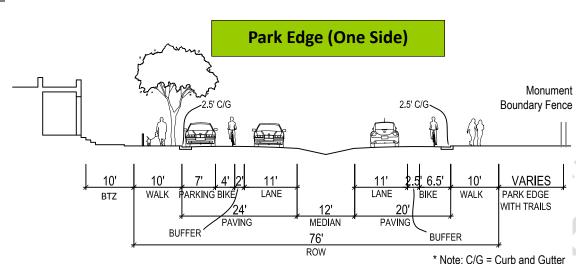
Street Type 4.1: Park Edge Single-Loaded Cross Section
